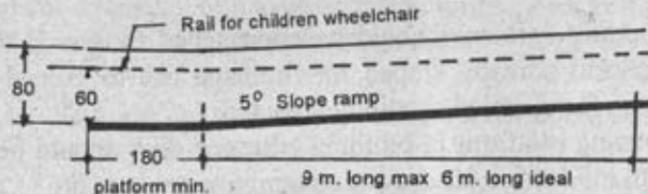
MINIMUM RAMP DISTANCE AND SLOPE
